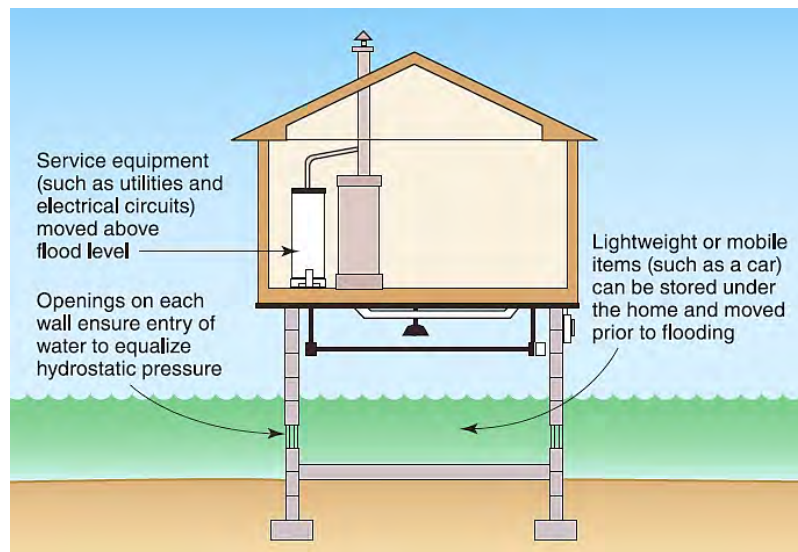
Home elevated on continuous foundation wall (FEMA P-312).
